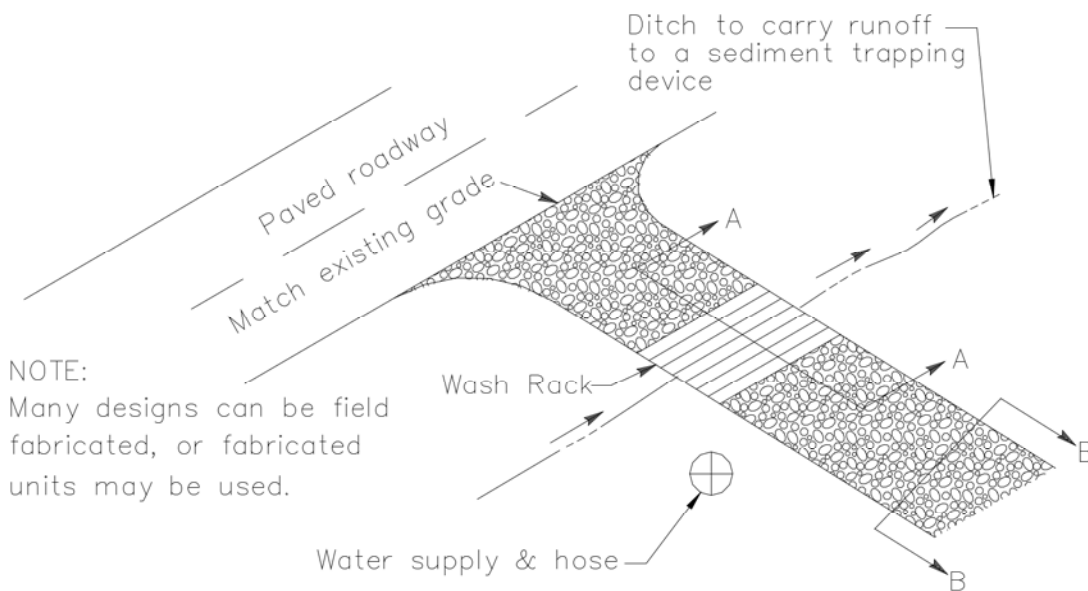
EXHIBIT "C" (Stormwater Pollution Prevention Plan)
